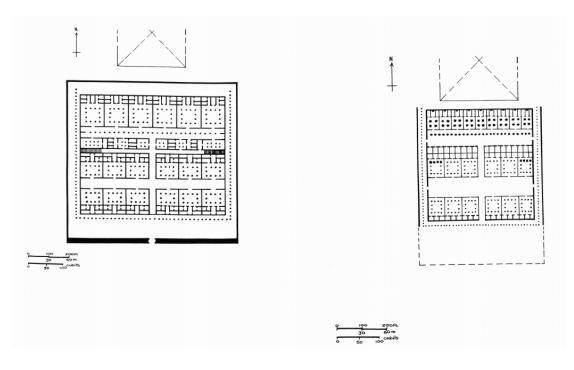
Architectural plans showing Petrie's Reconstruction of the Labyrinth, British Library Collection
